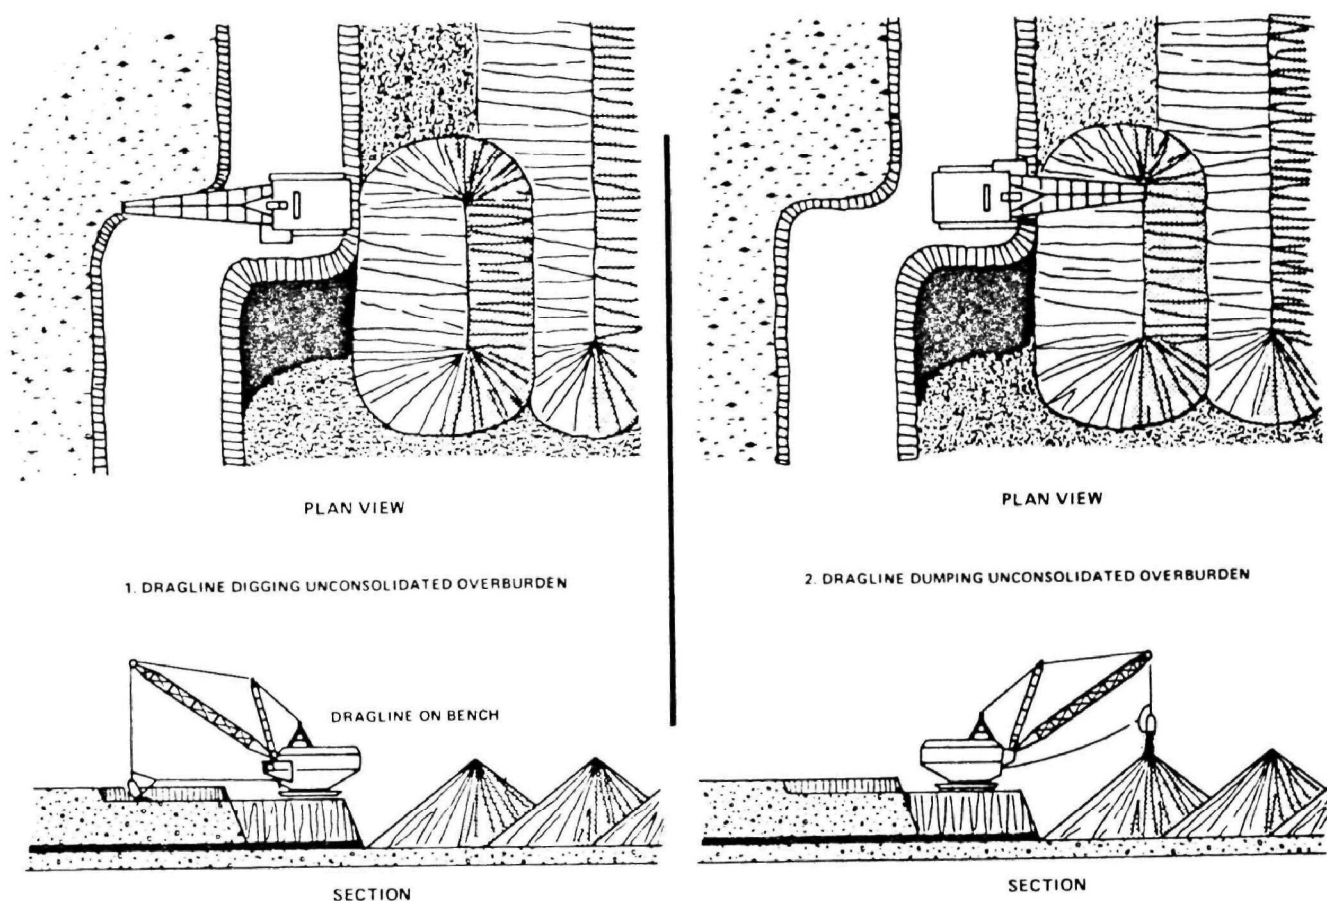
Plan and Section Views Showing Side-Benching Procedure
